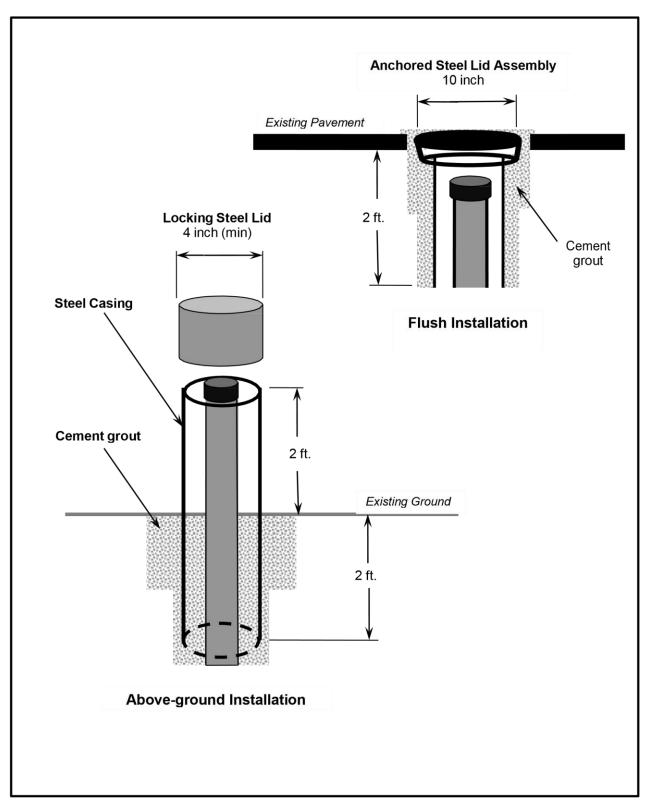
Inclinometer Protective Casing (Typical) N.T.S. SECTION 208 - SPECIAL INSTALLATIONS AND FIELD TESTING
